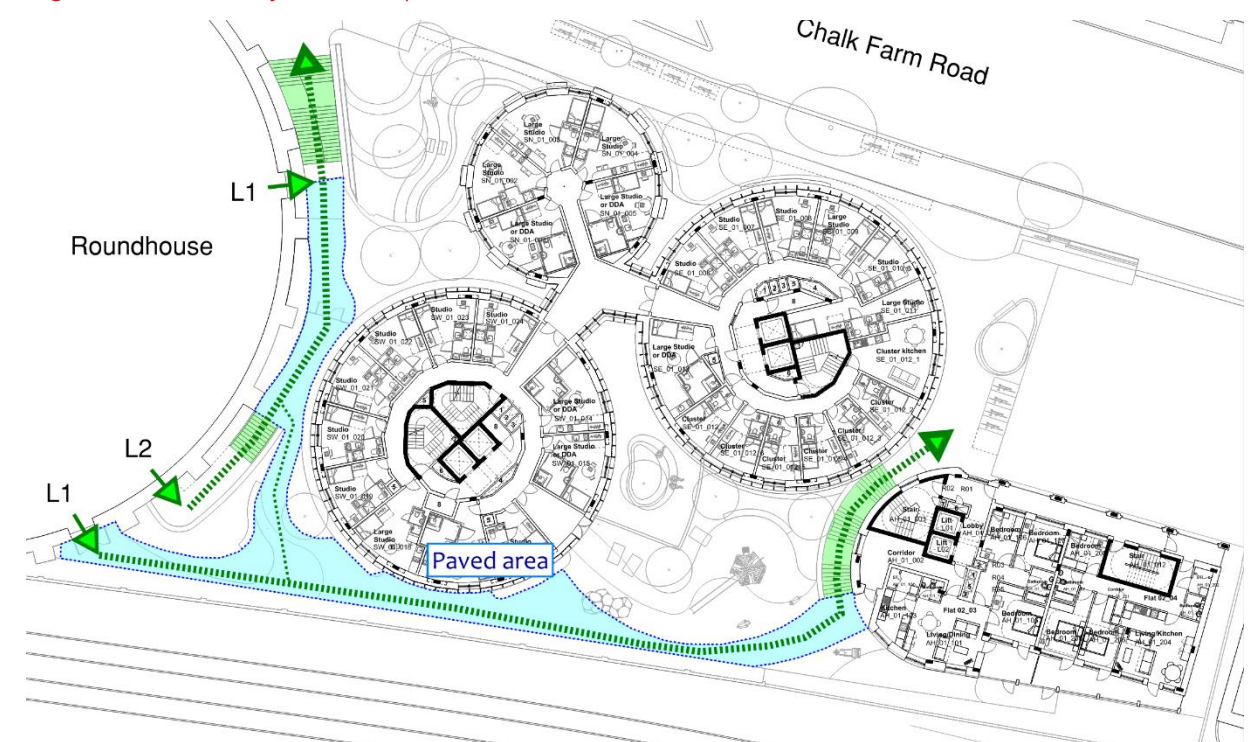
Summary of Roundhouse exits and escape routes across First floor podium
